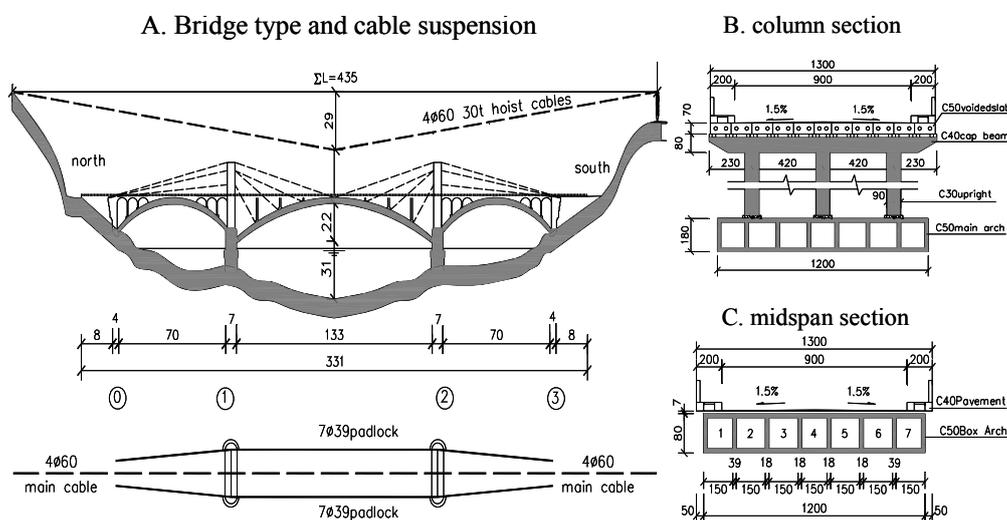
Construction of Hunan Wuqiangxi Hydropower Station Ruanshui Bridge Figure
